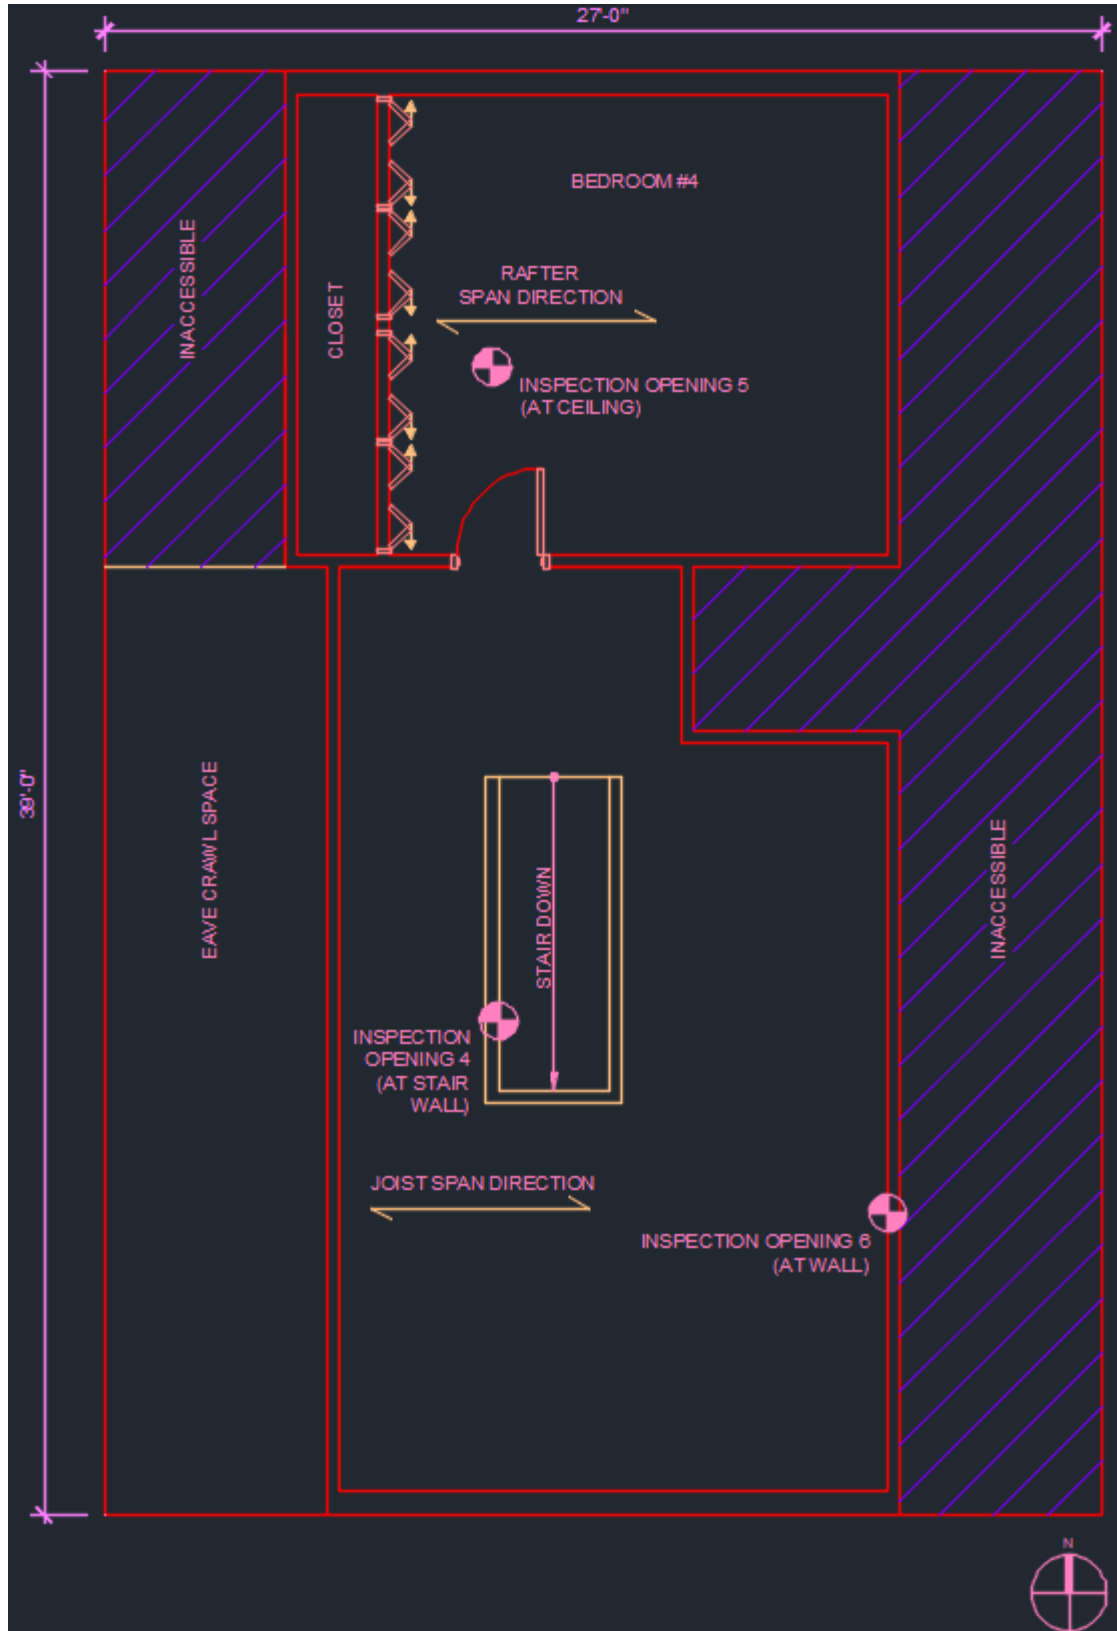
Second Level plan indicating approximate inspection opening locations and building configuration.
